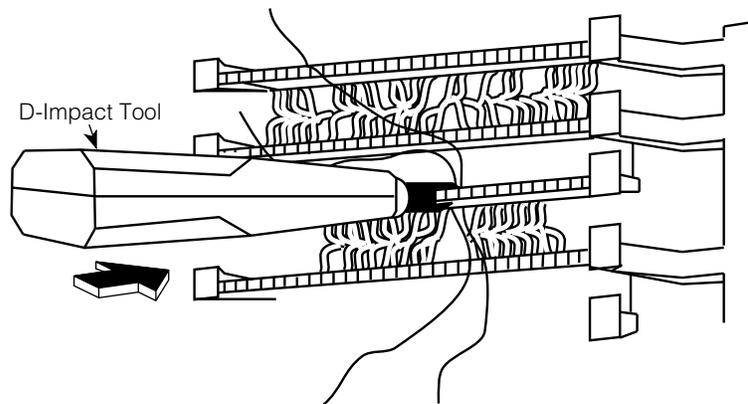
Using the D-Impact Tool to Seat the Conductors
